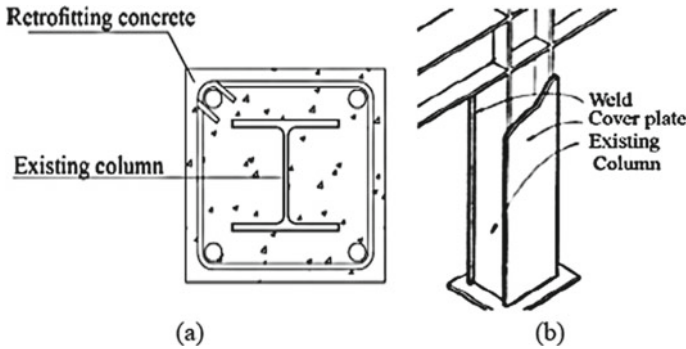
Types of jacking, a by concrete and b by steel plate [15]
